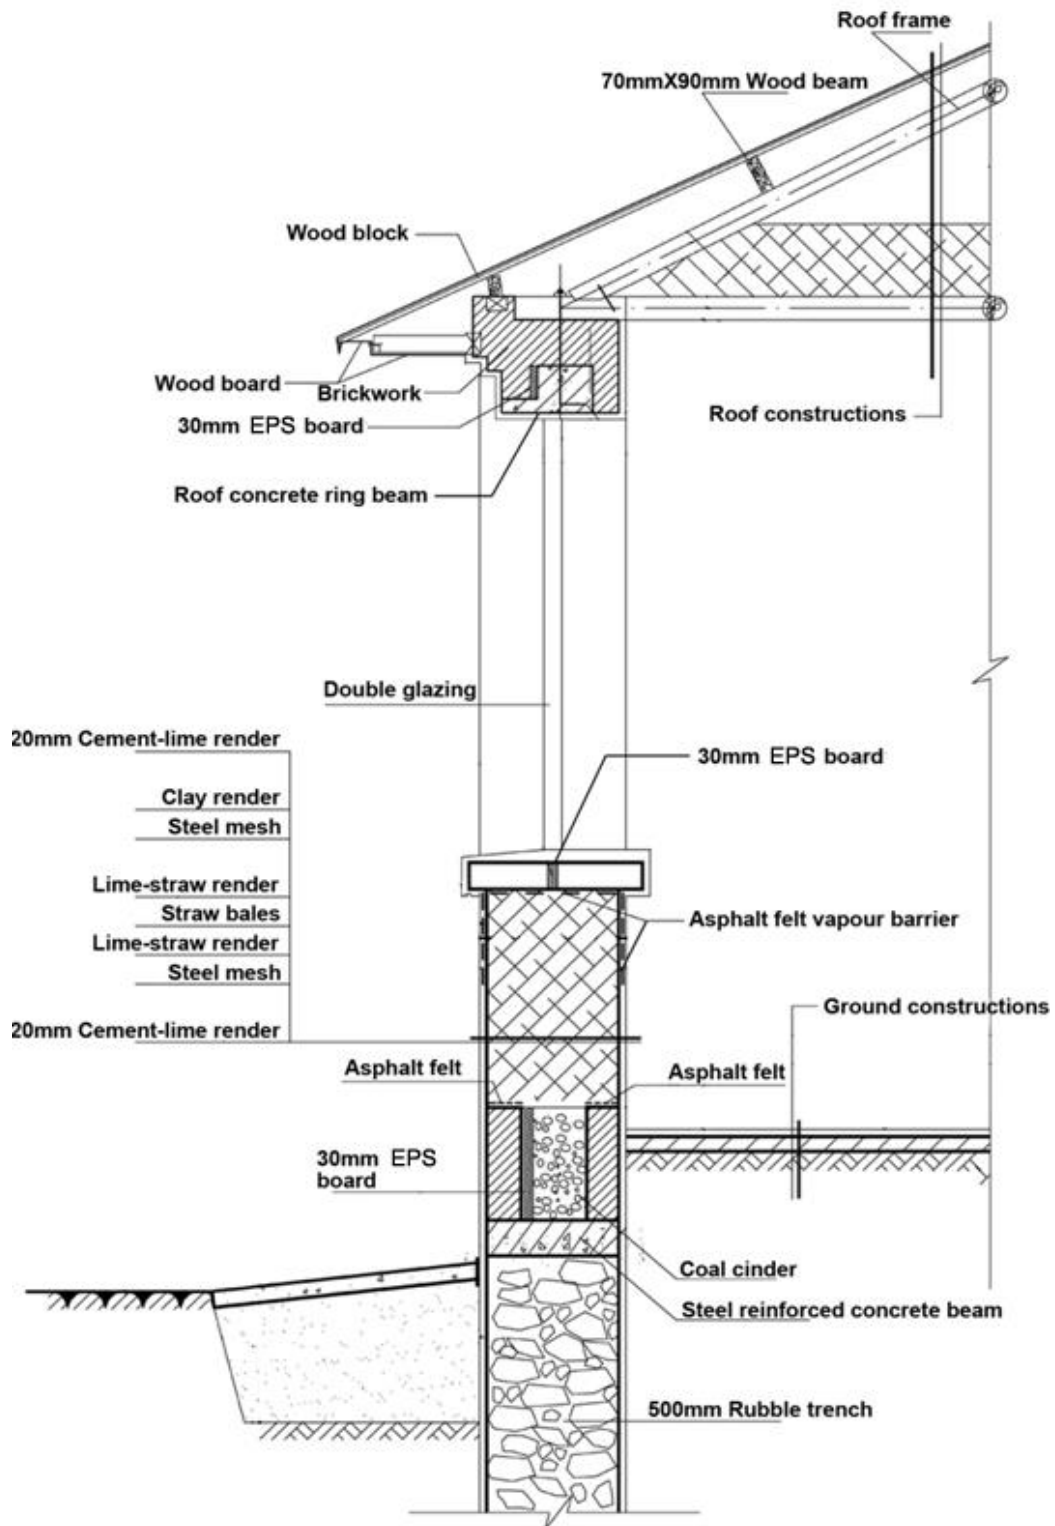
Reference foundation design of the foundations. ((DCHP), 2007)
